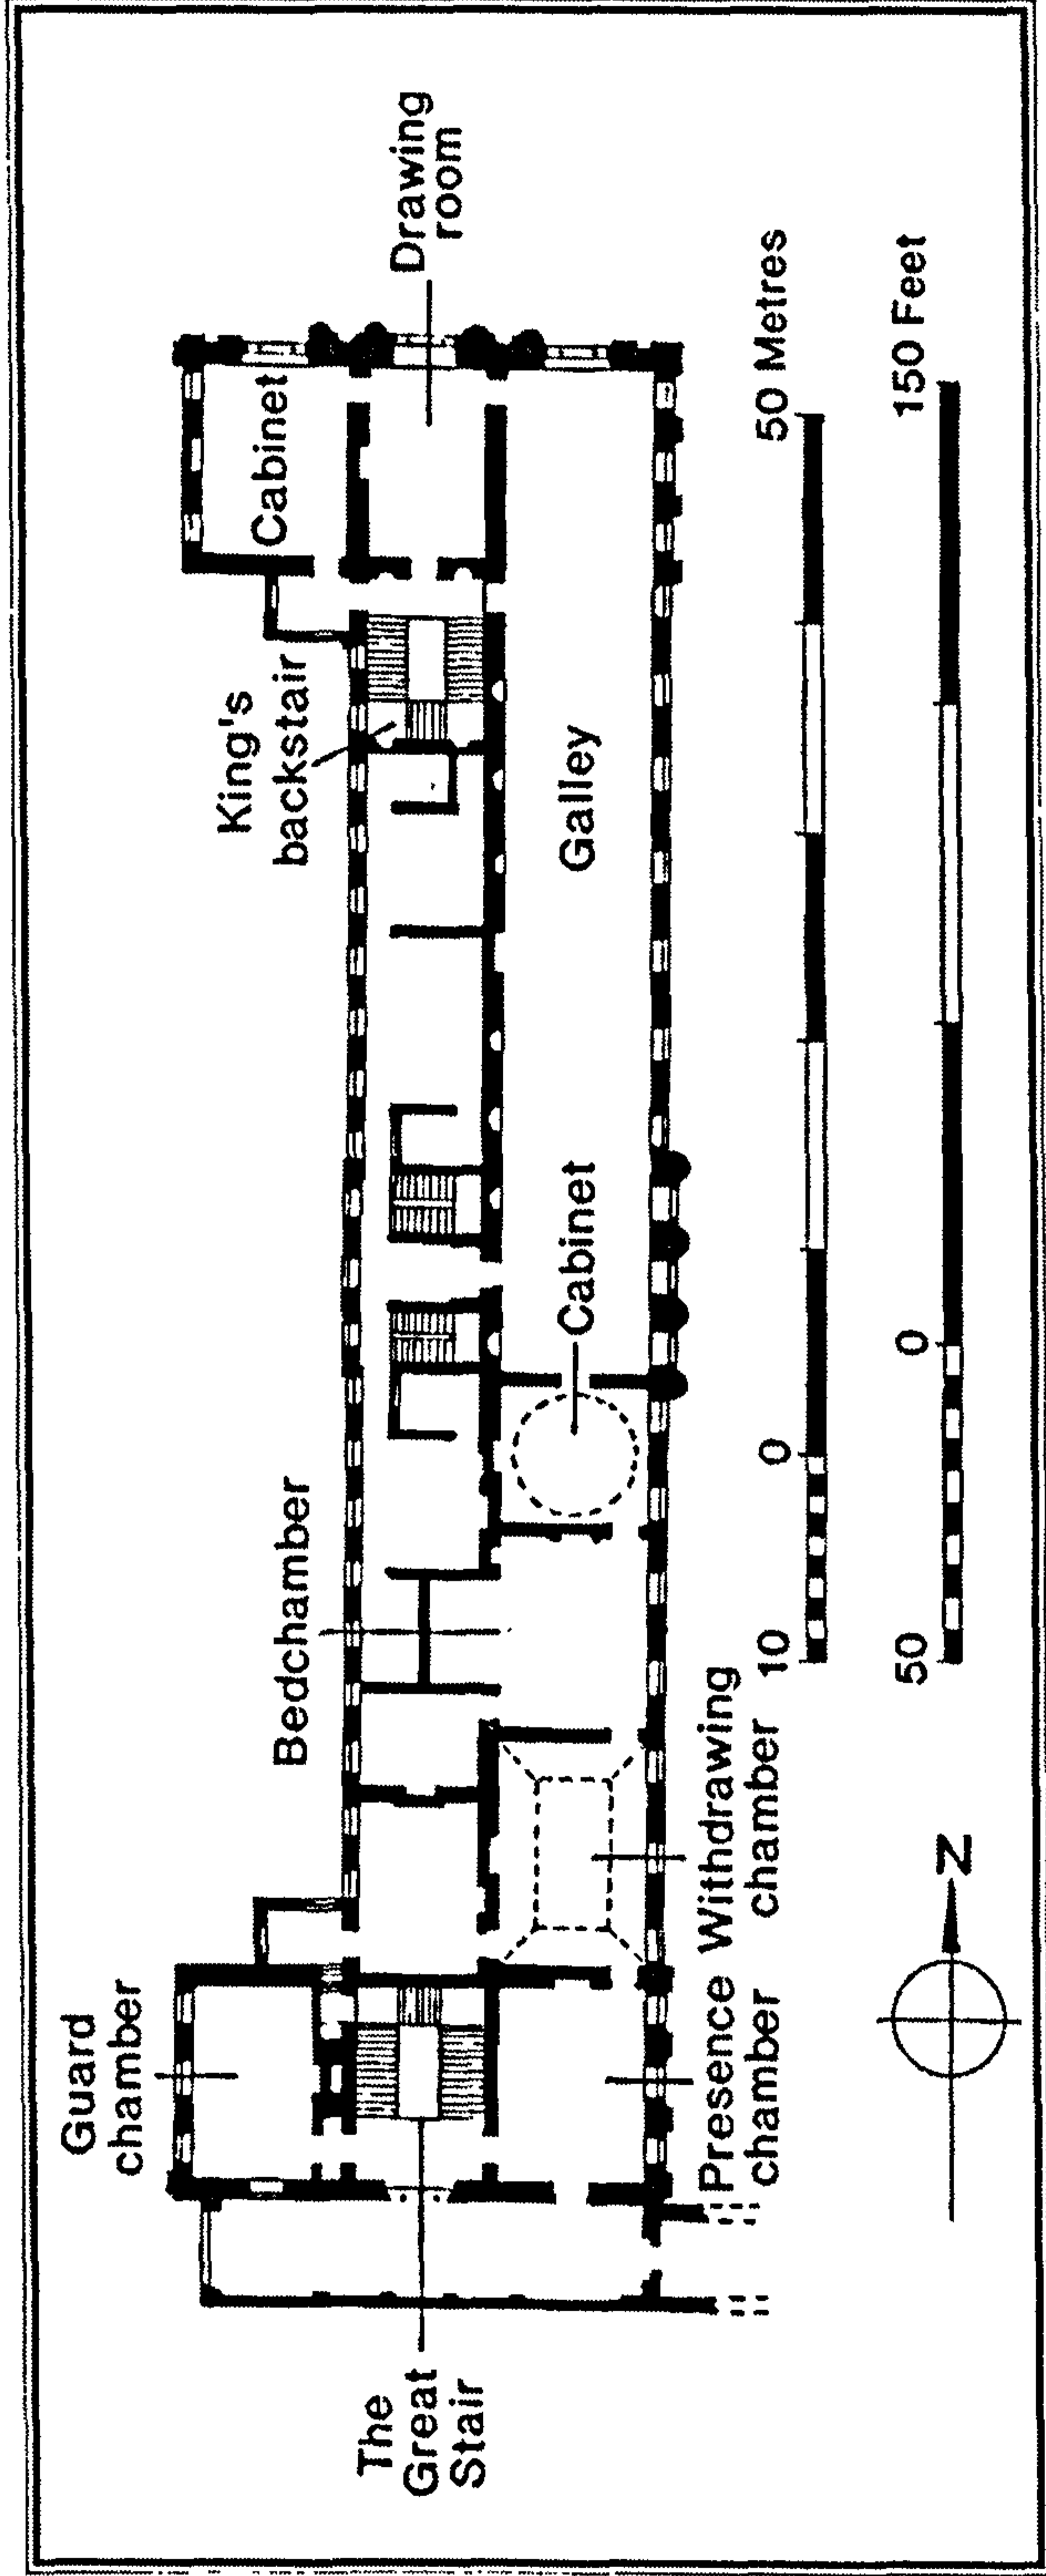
Plan of the royal apartments as they were to be set up on the first floor of Charles II's new building at Greenwich.
